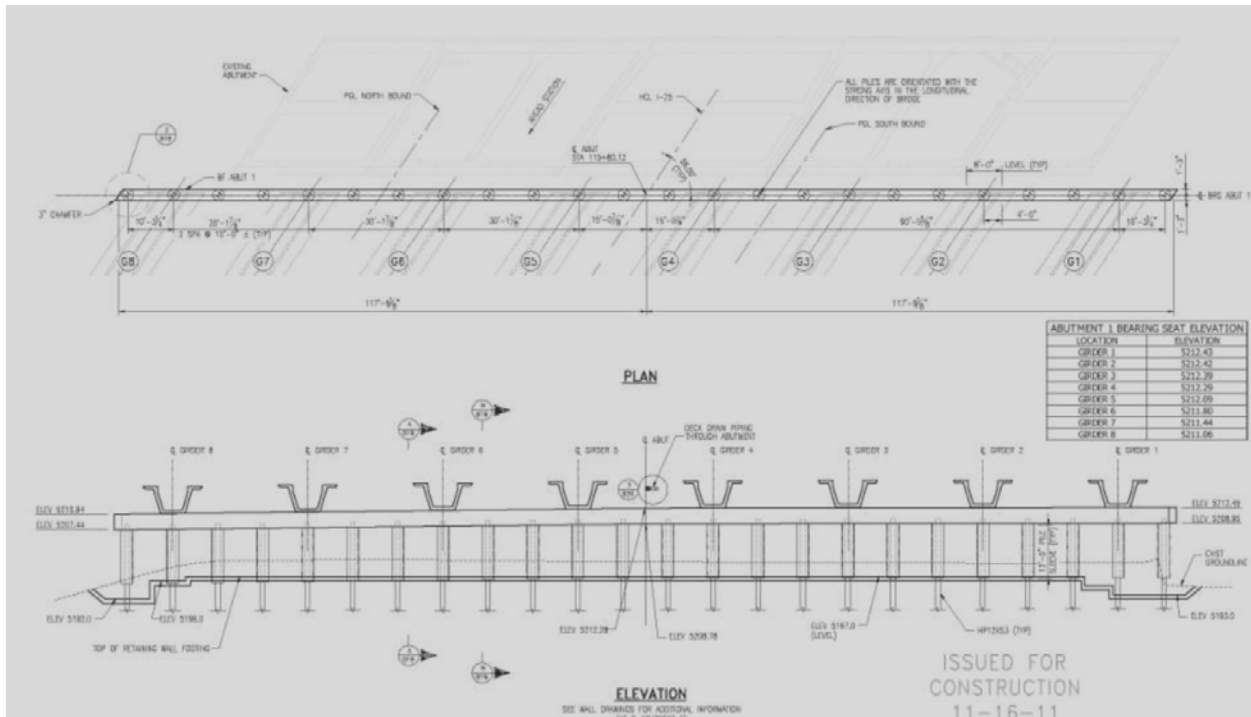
Drawing. Integral abutments on flexible steel piling (courtesy: Colorado DOT).
